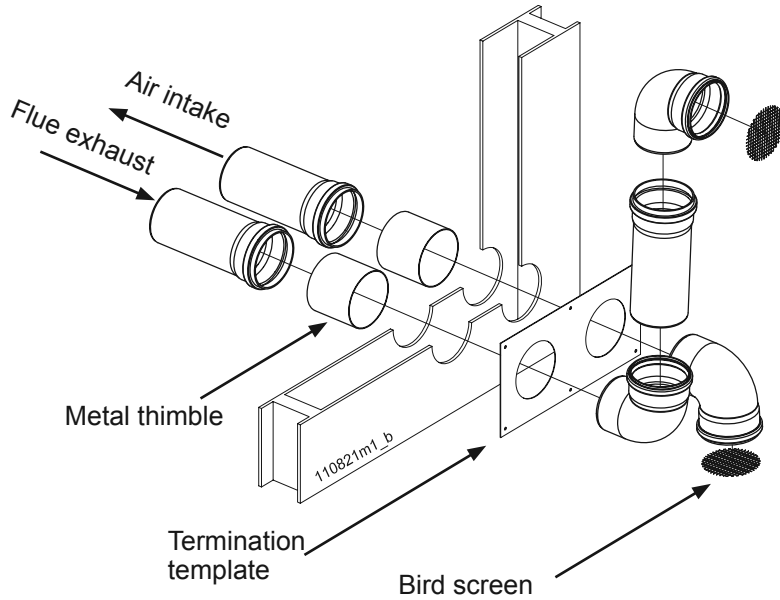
Two pipes sidewall termination of air and vent (if space permits)
